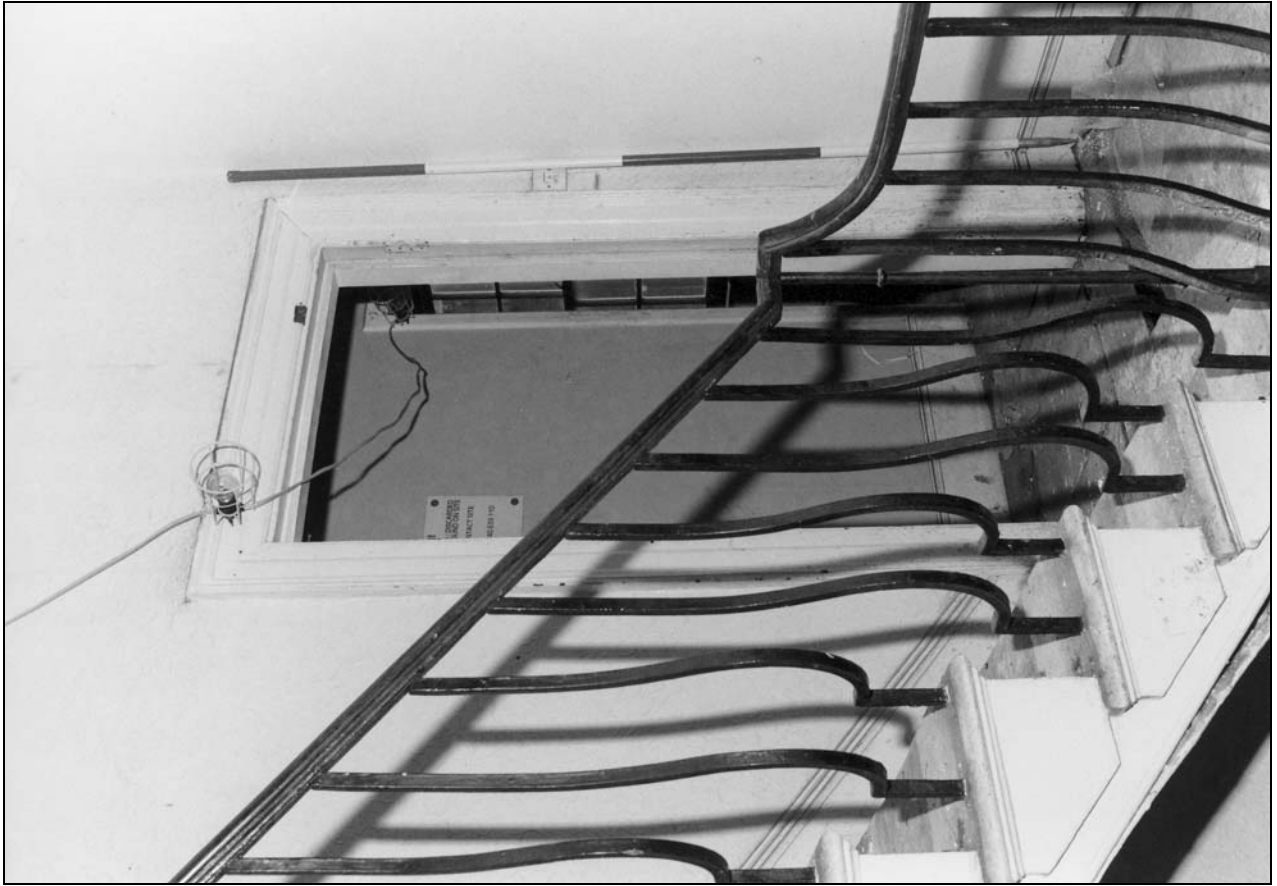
South wing: first floor landing F08, from the north-west (film 4, frame 7)
